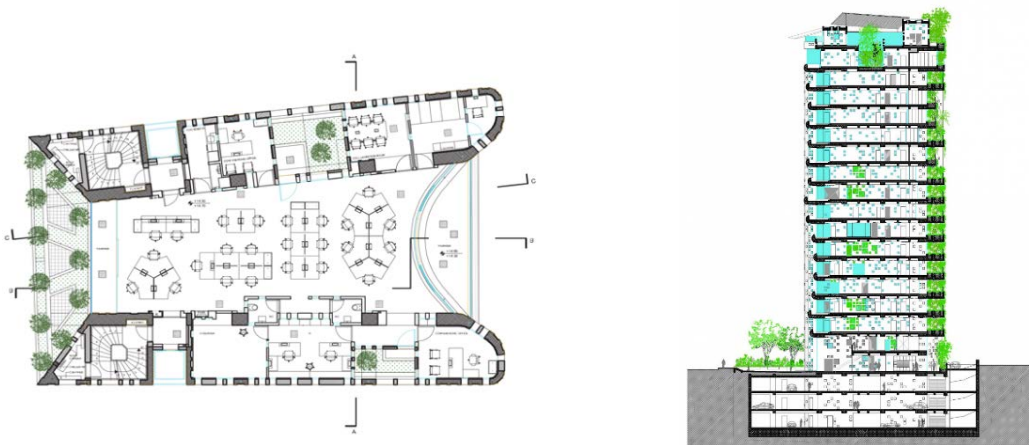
The ground floor plan and the vertical section of Jean Nouvel's Cyprus Tower
